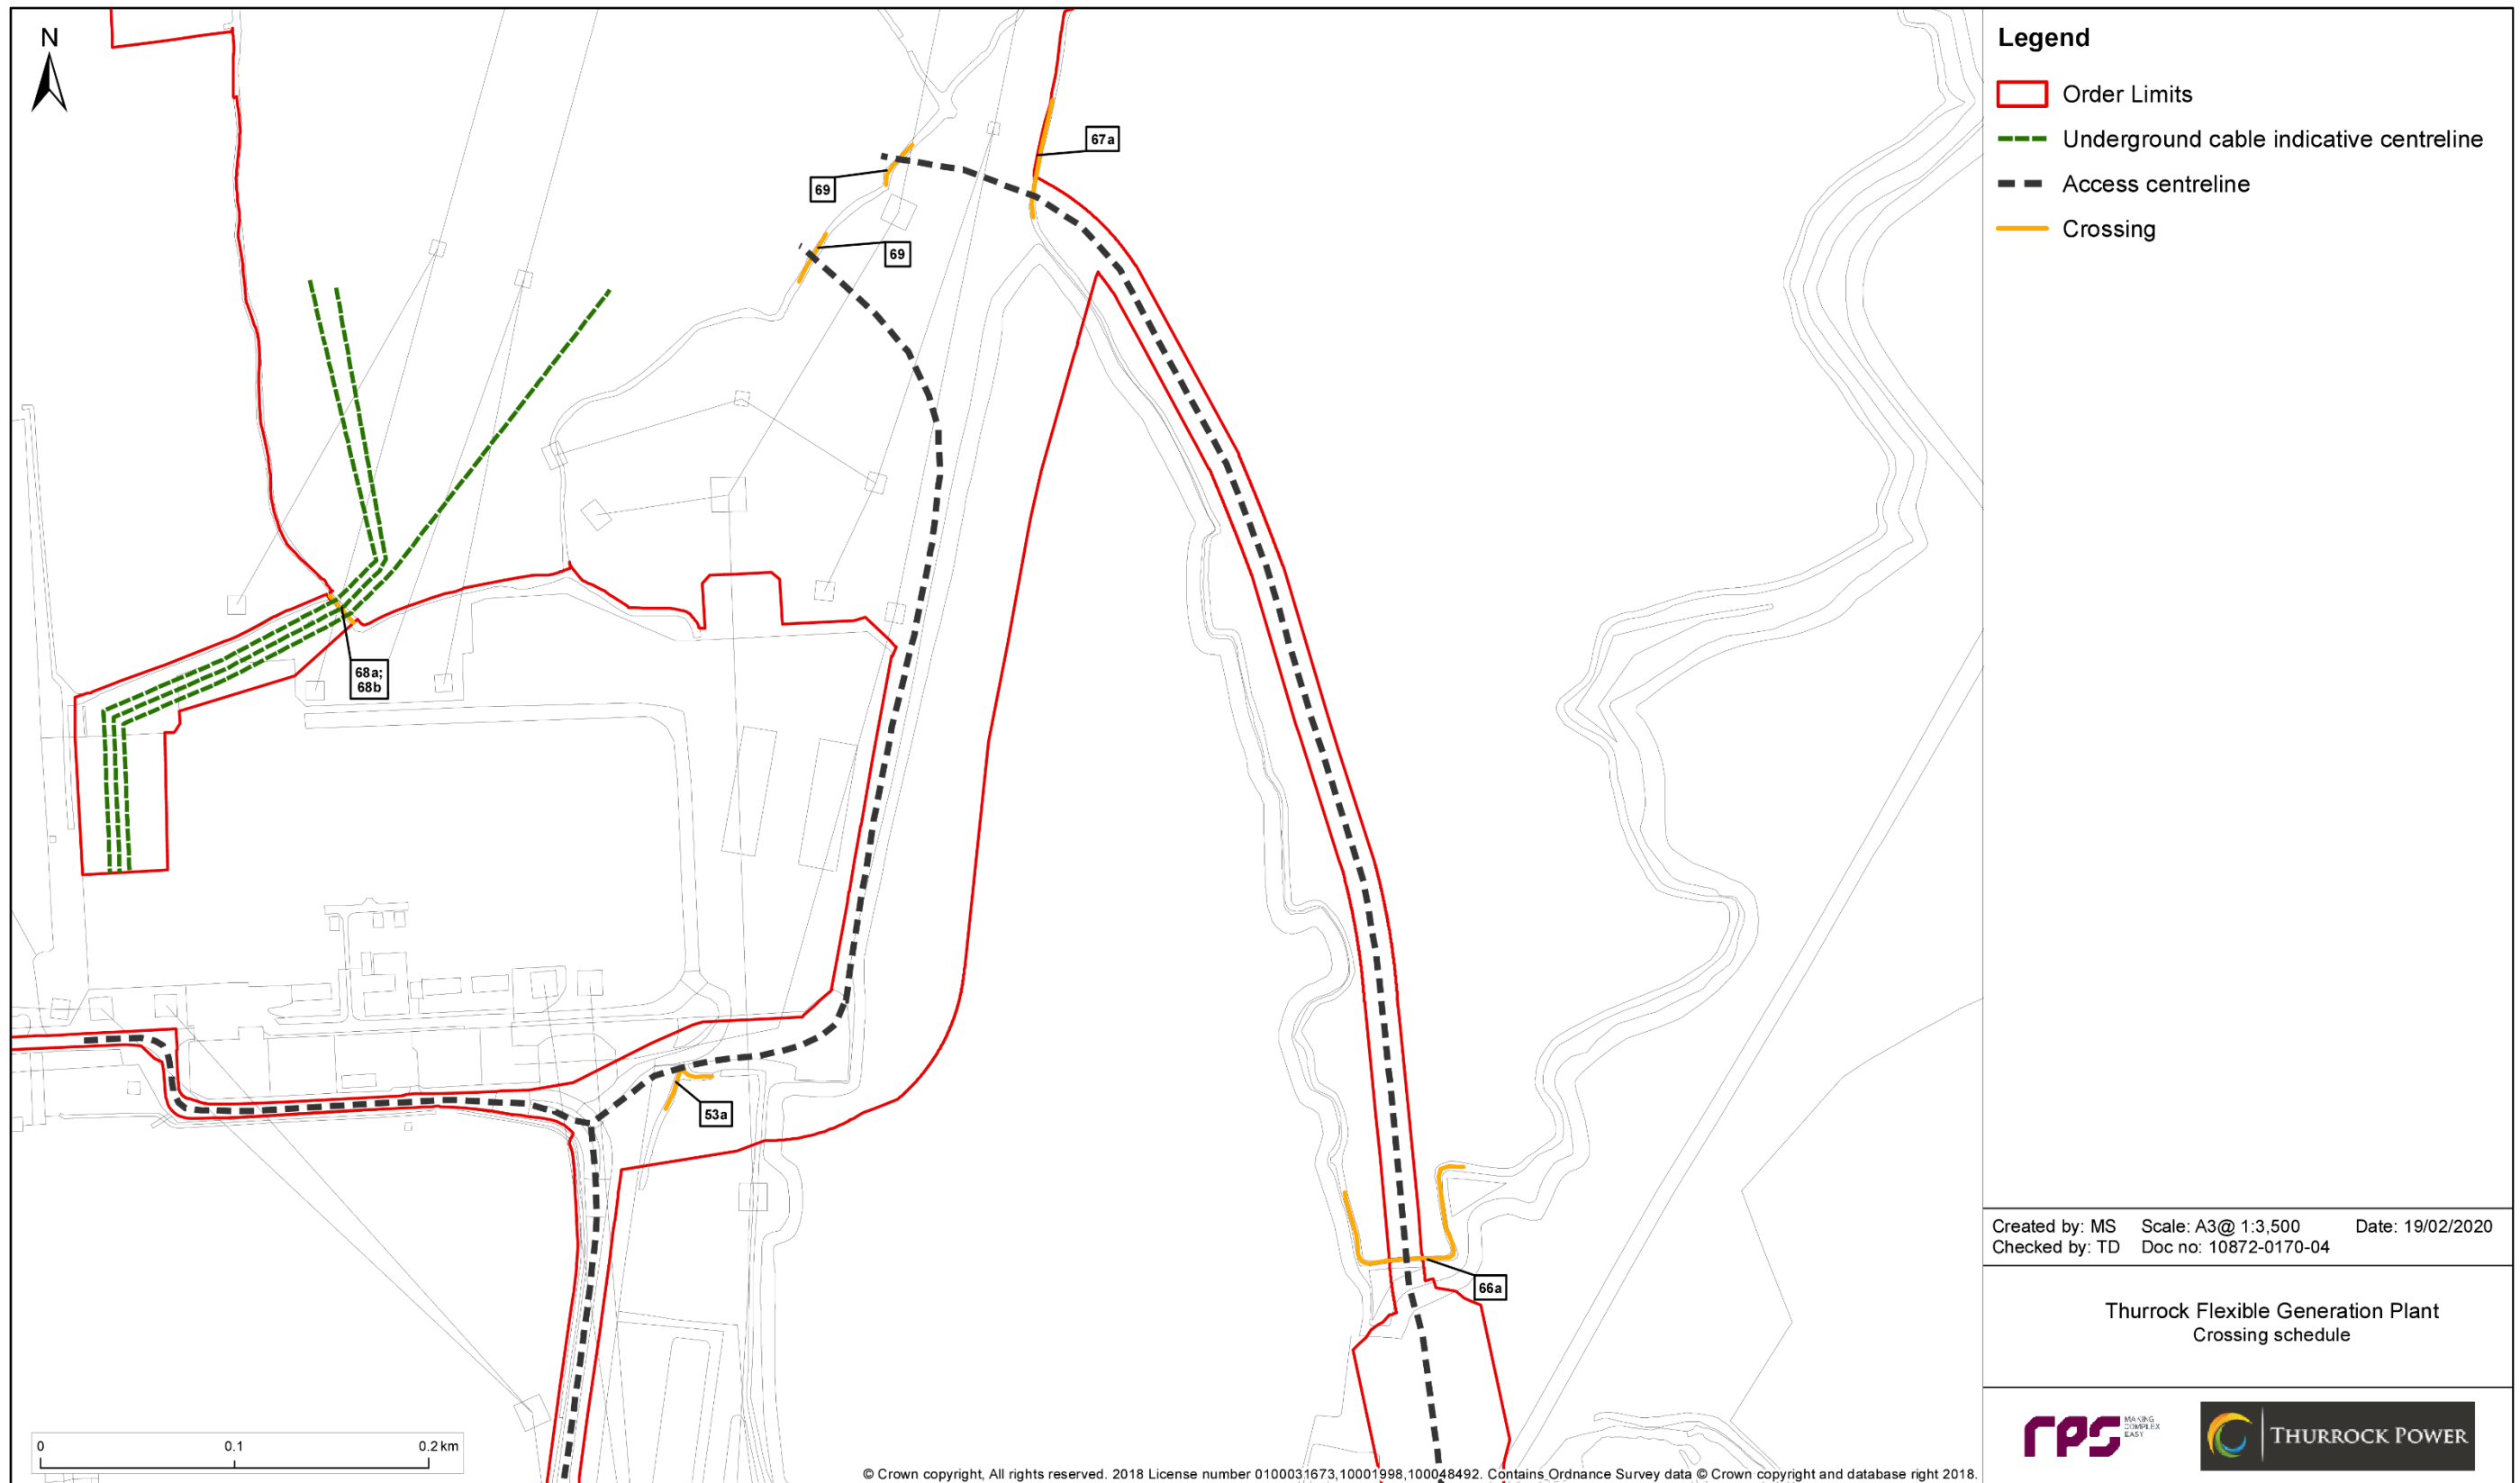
Gas pipeline, underground cable and access road crossings – sheet 4.
